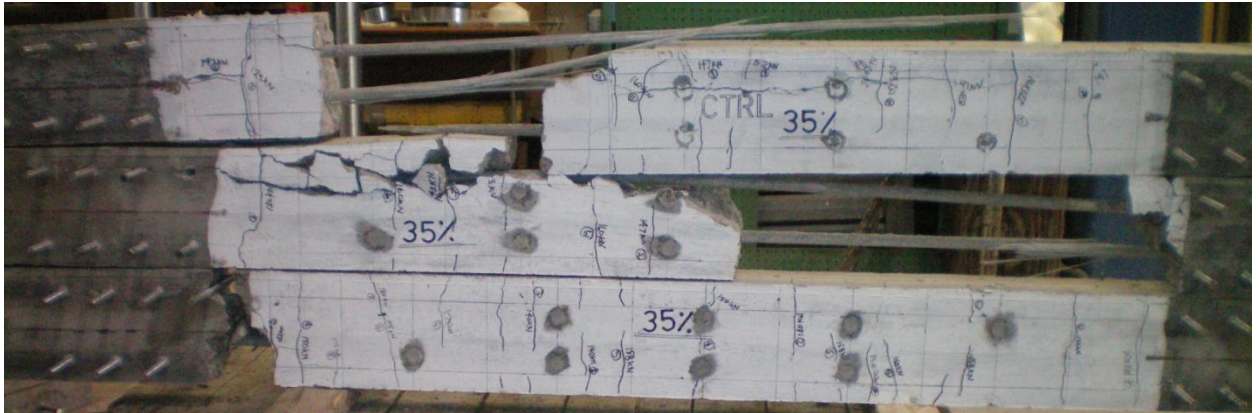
Crack Pattern and Mode of failure of Straps Prestressed at 35%-B
